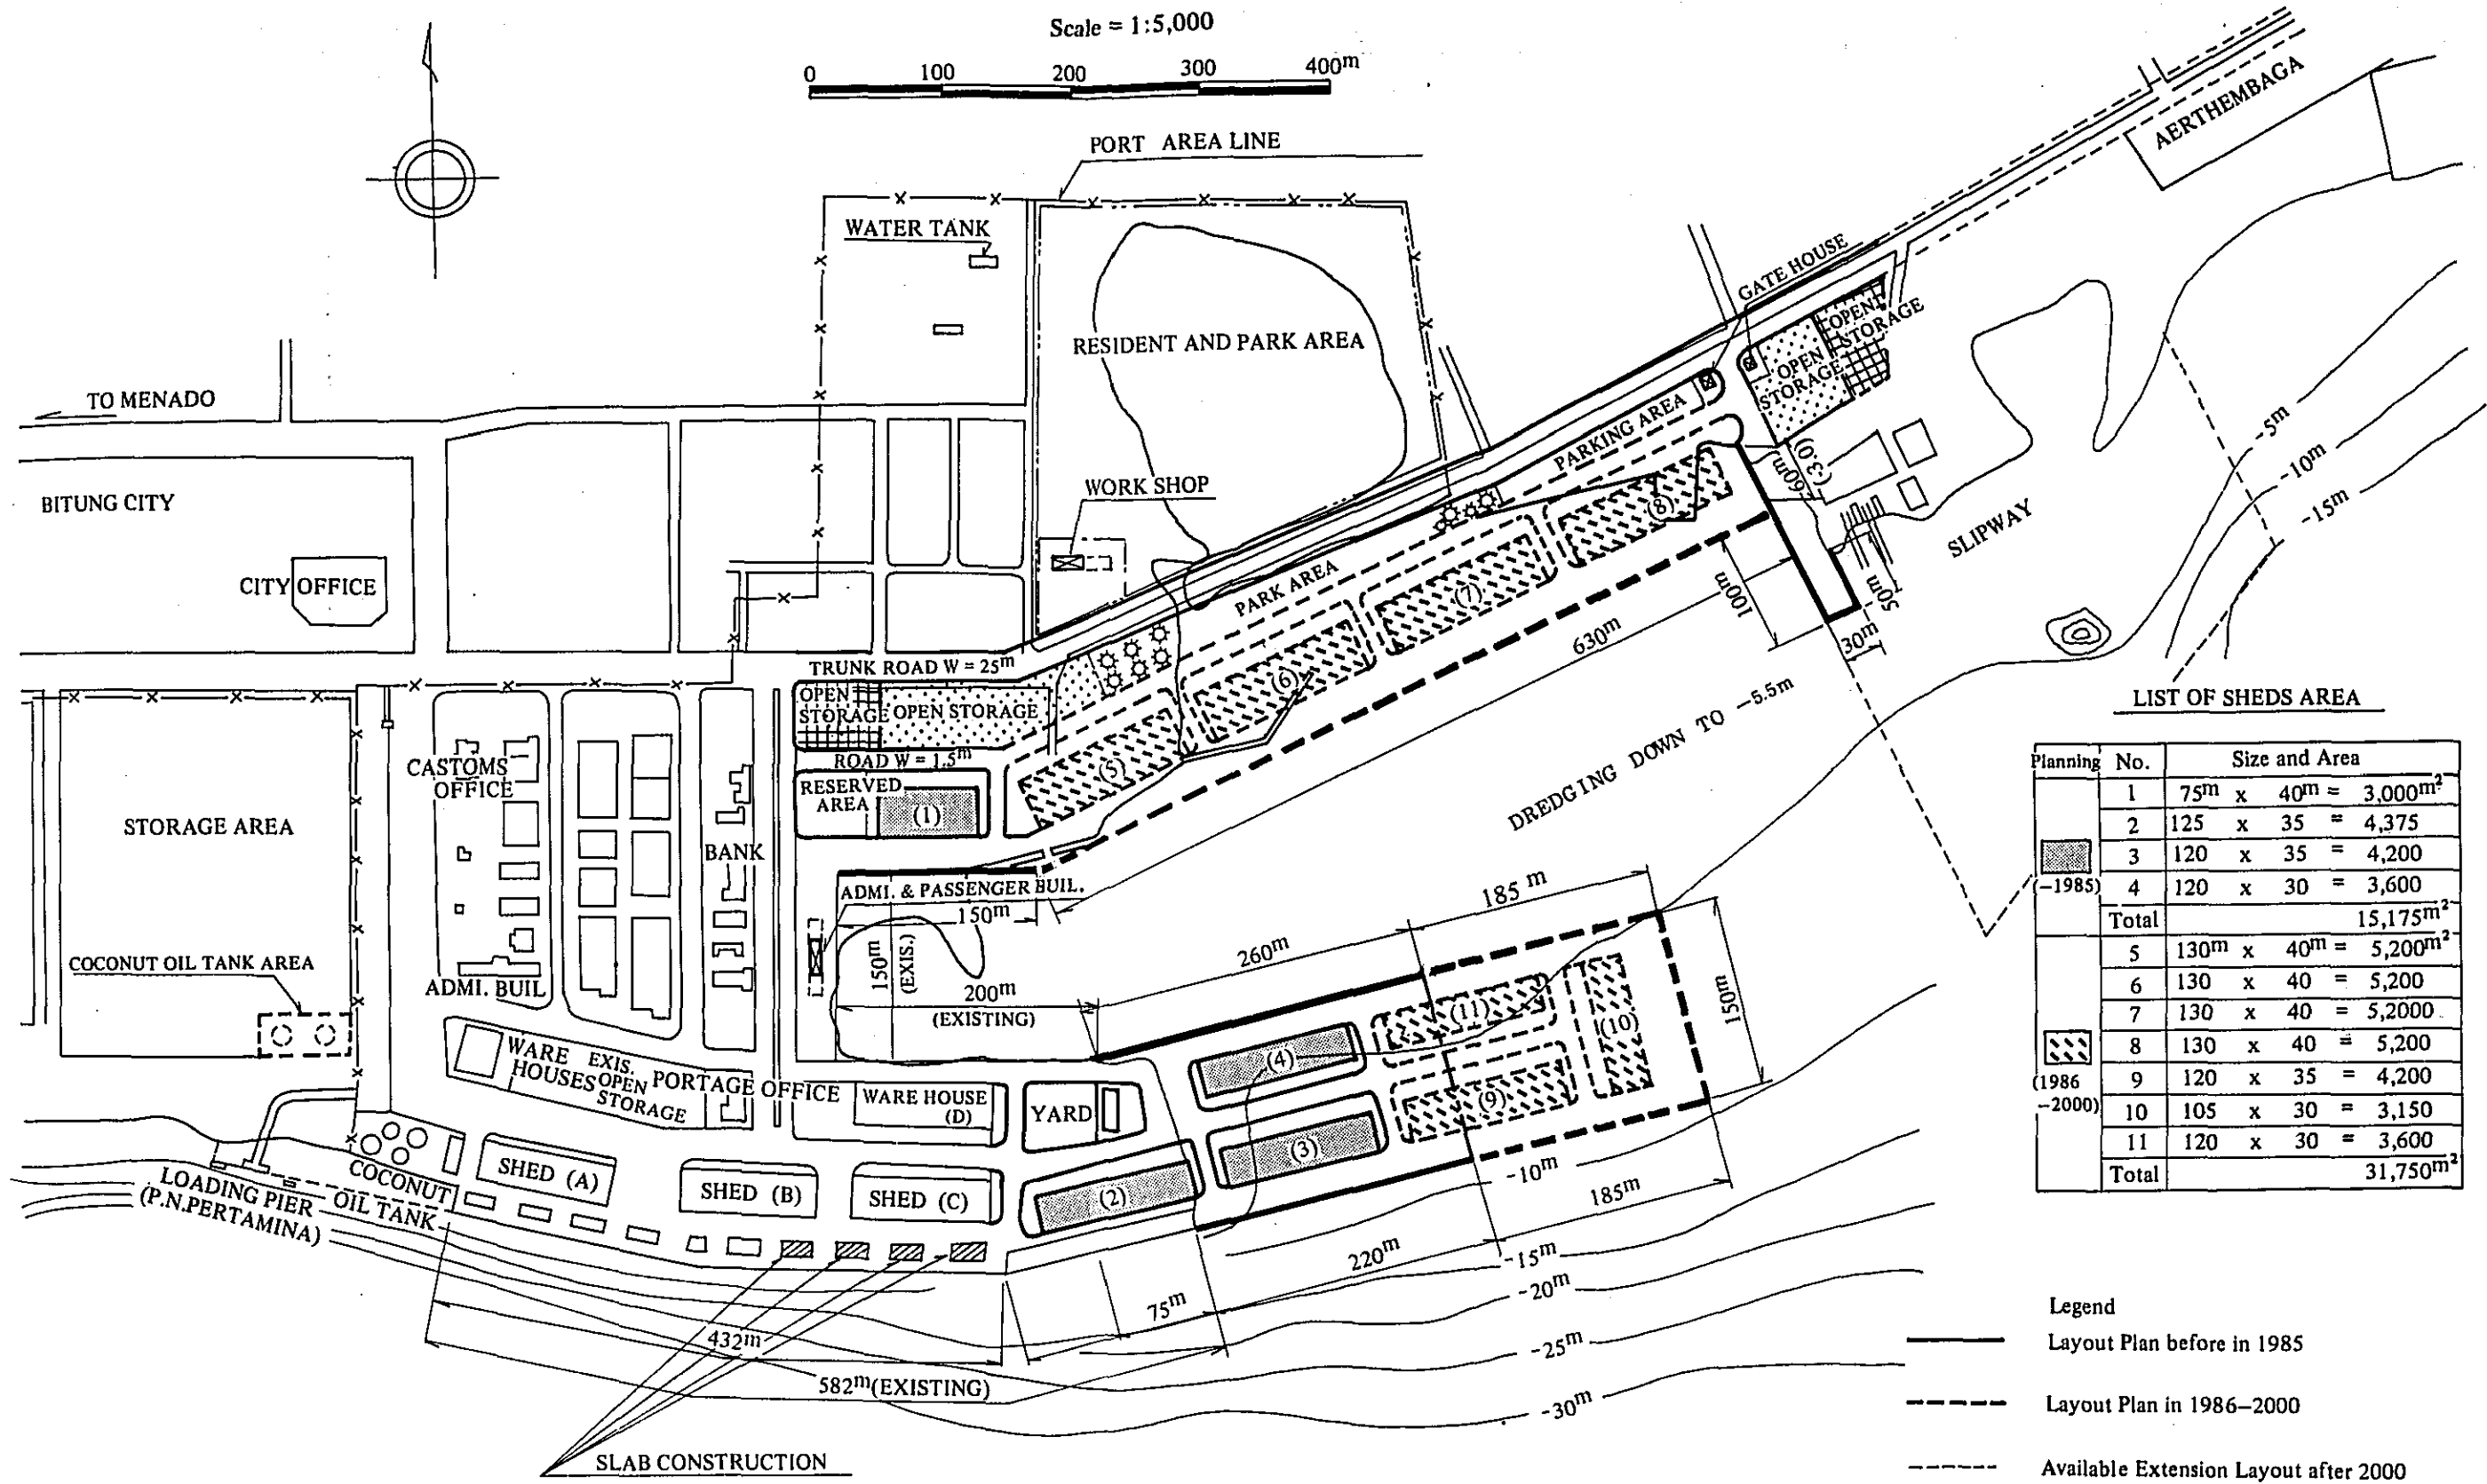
Alternative-3. Layout of Port Terminal Facilities
